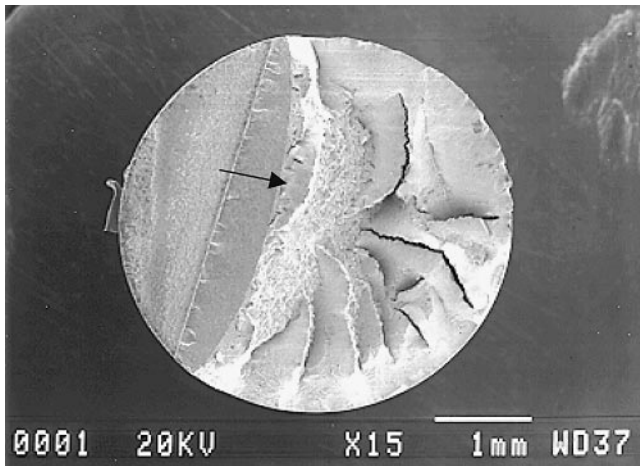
Overview of the fracture surface for an uncharged, fatigue precracked ASTM A416, grade 270 prestressing tendon. The transverse chord-shaped EDM notch and fatigue precrack can be seen on left.
